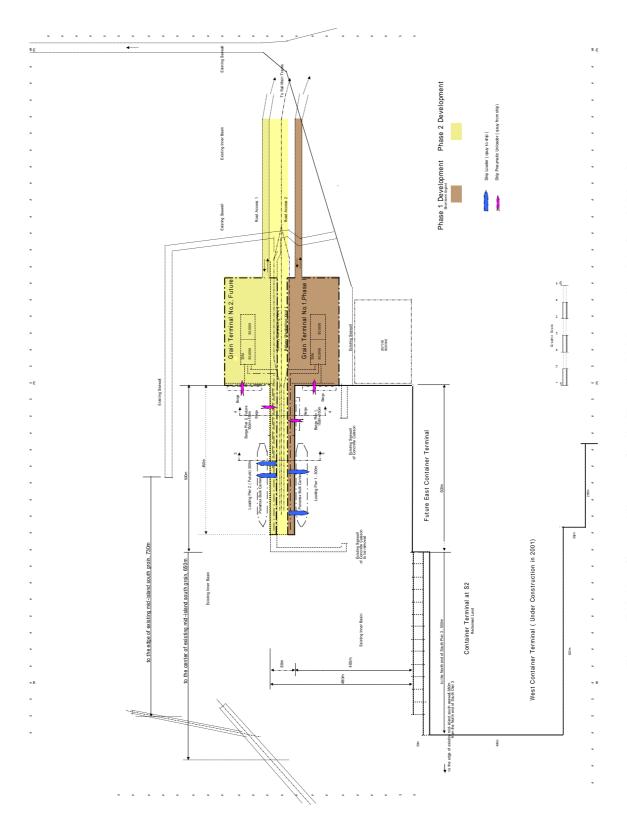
General Layout Grain Terminal, Alternative A1: South Pier 3
